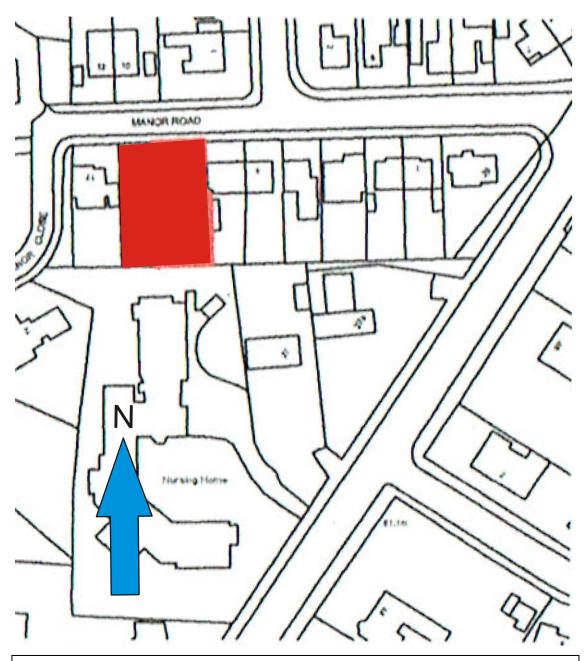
Site location at an original scale of 1:1,250 (not to scale), (extract from Architects plan). The site is shown in red.
